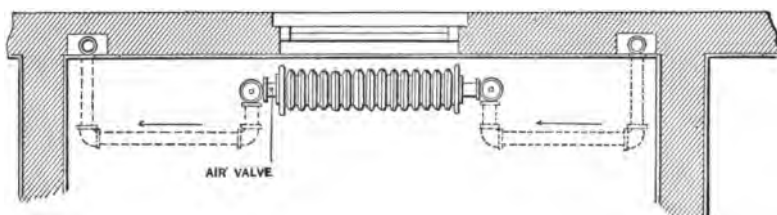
Plan, Two-Pipe Radiator Connections in Floor
